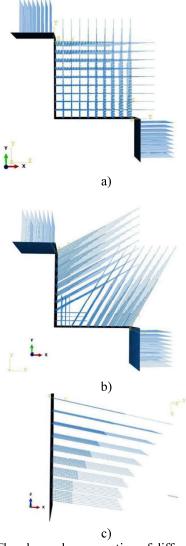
The plan and cross section of different types of configurations a) ground-anchors with 90 degrees b)combination of ground-anchors with 90 degrees with soil nails with 60 degrees c)cross section of the wall supported by ground-anchors
